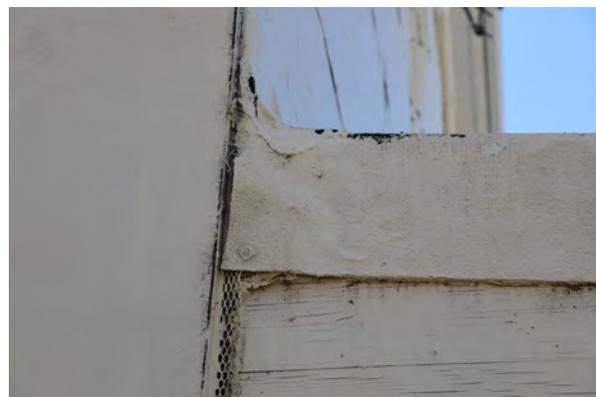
Exposed stucco lath between northwest addition and the temporary wall and roof of the unfinished west addition
